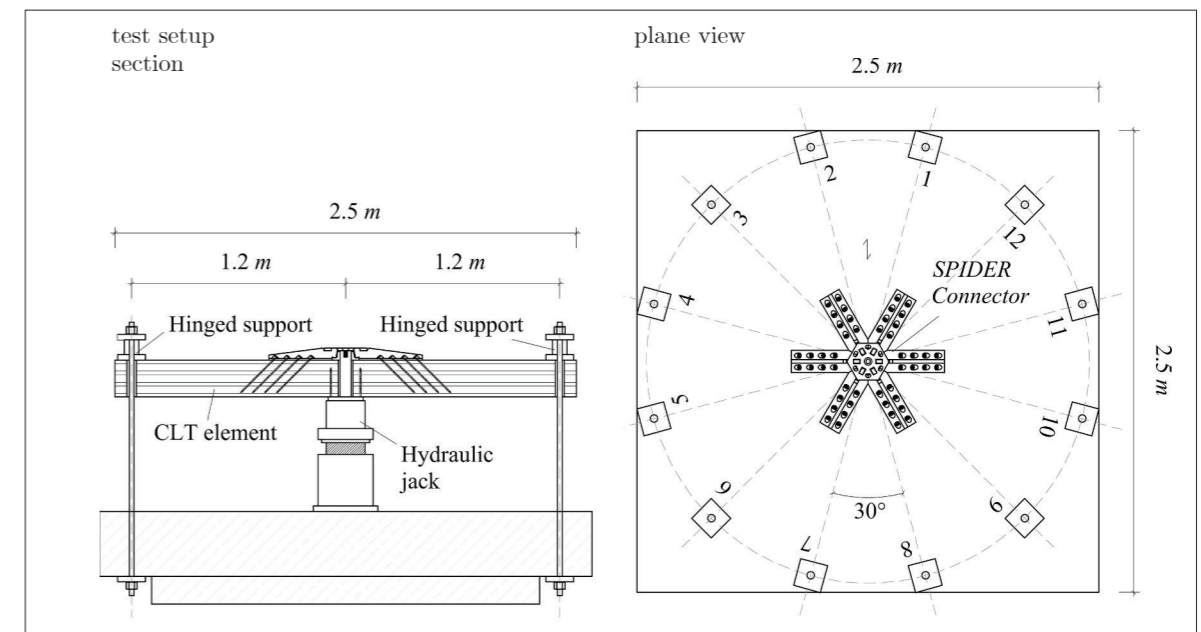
Punching test on CLT element using system connectors (MAURER AND MADEREBNER 2021)
